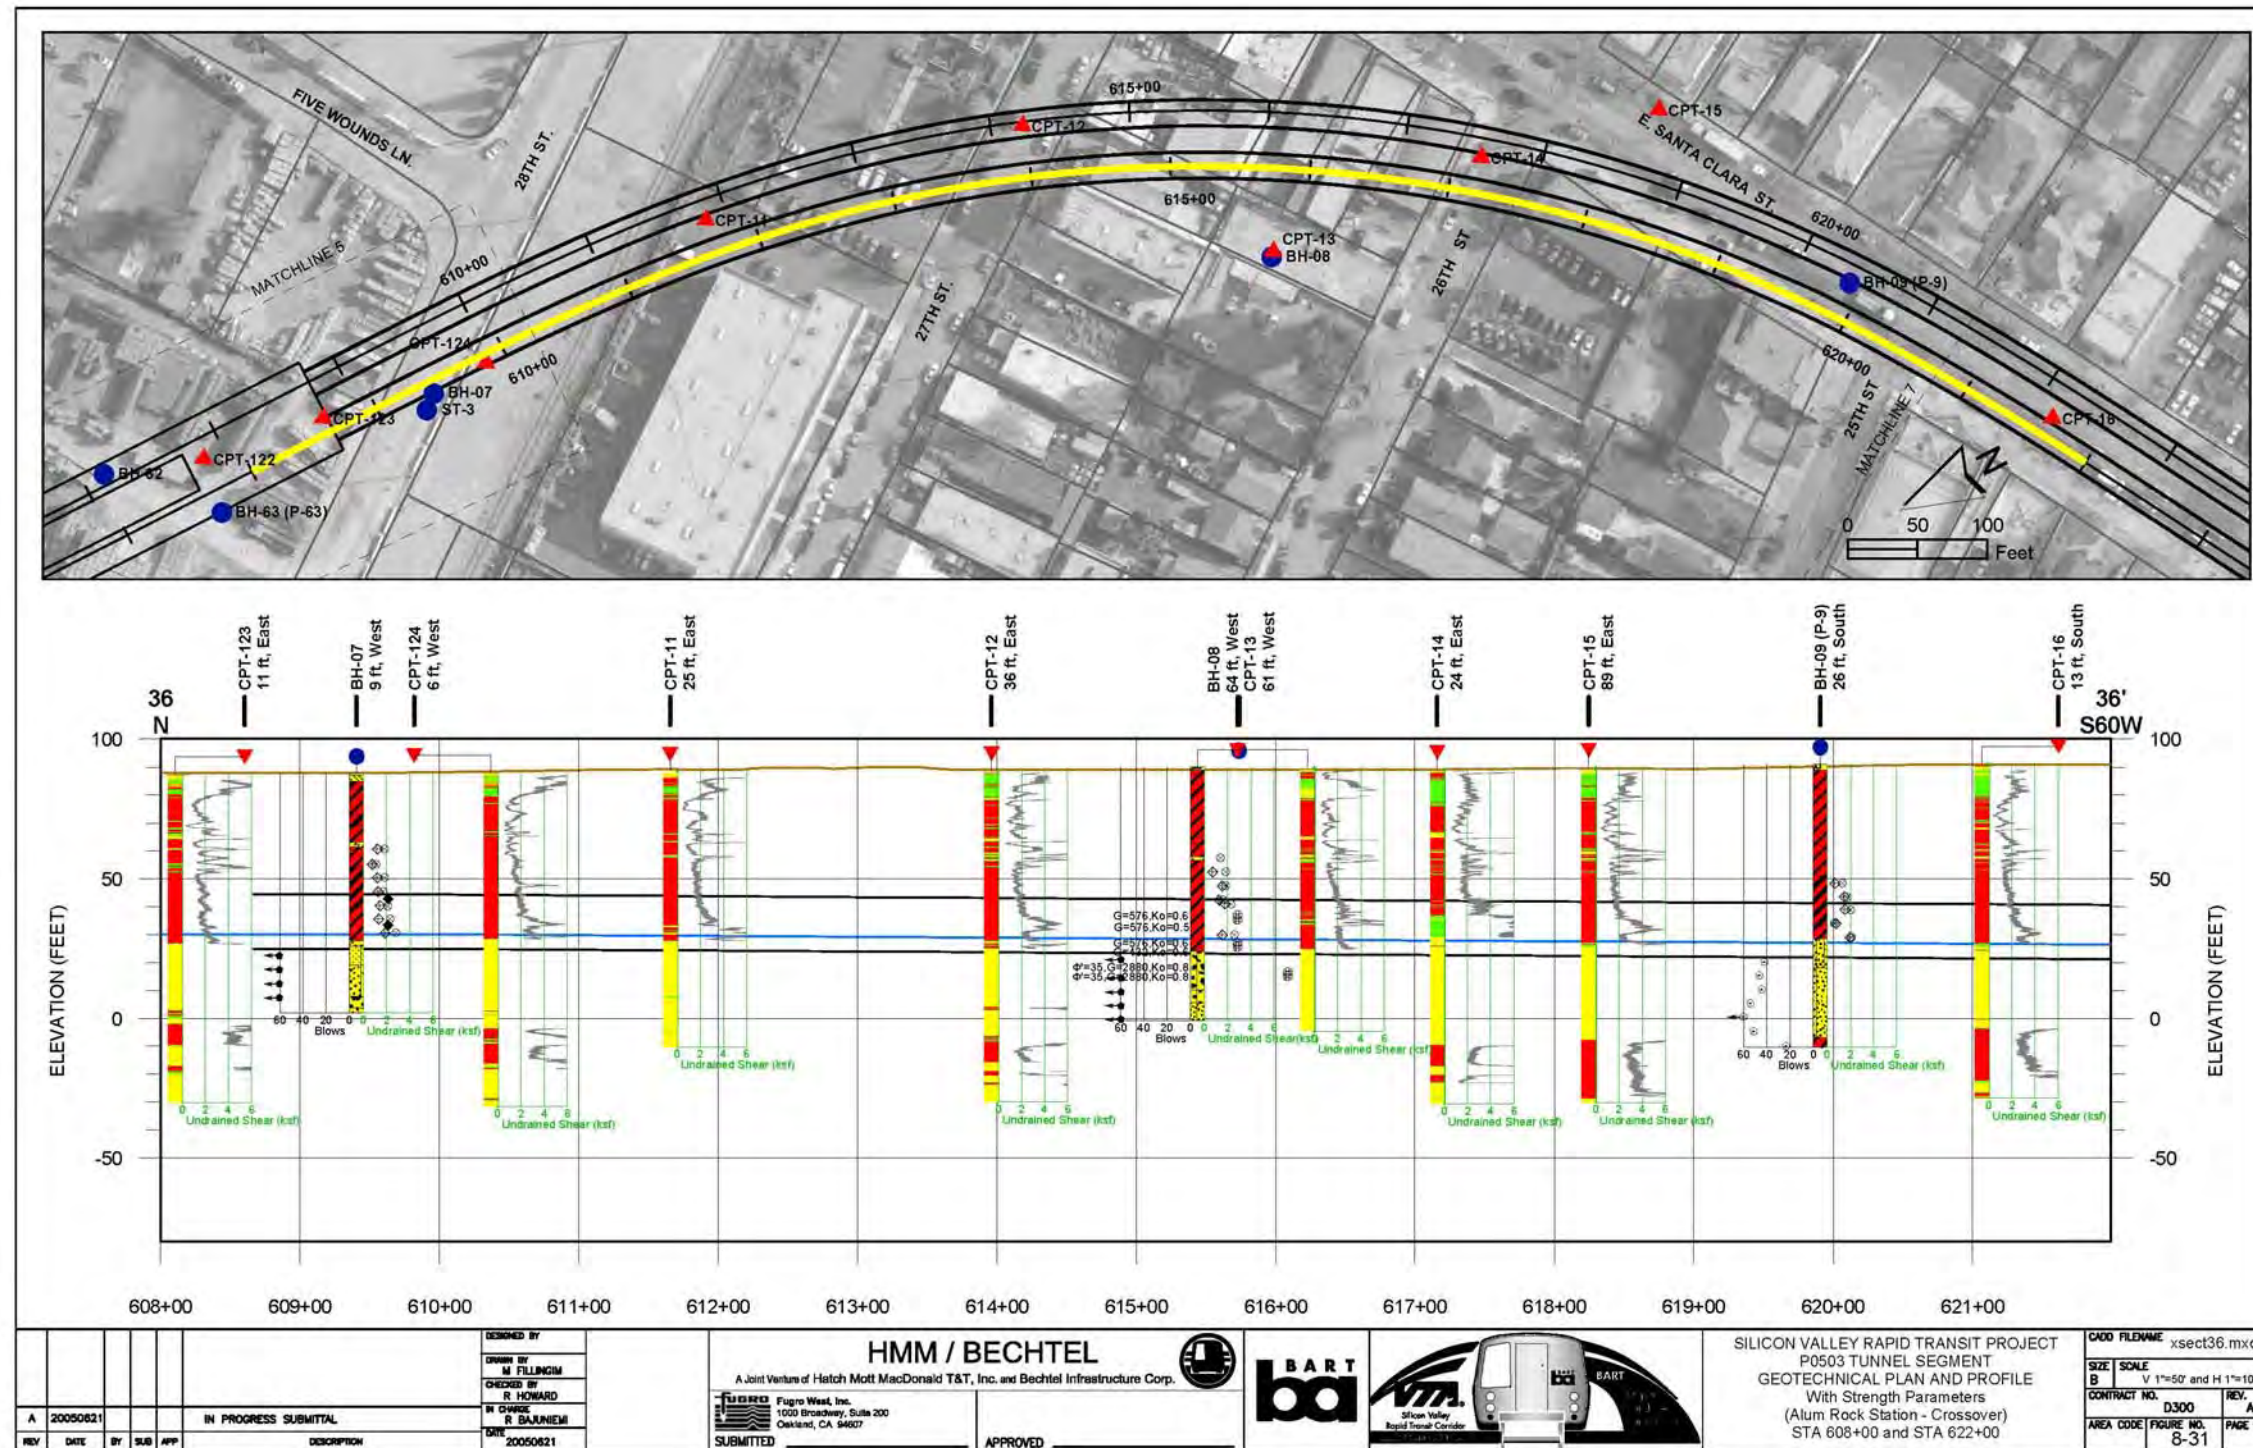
Geotechnical Plan and Profile with Strength Parameters: 608+00 to 622+00.
